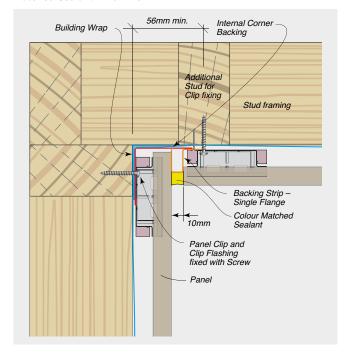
External Corner Detail – With Coloured External Corner Trim – Plan View
